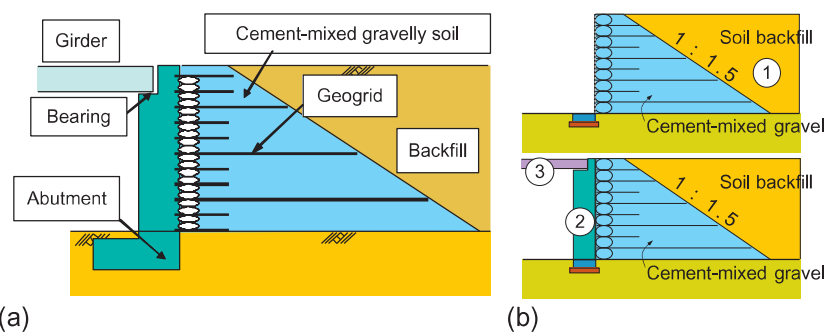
(a) GRS bridge abutment and (b) construction procedure.
